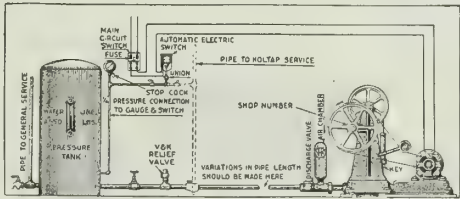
Belt Drive "OPEN CYLINDER" DEEP WELL PUMP
